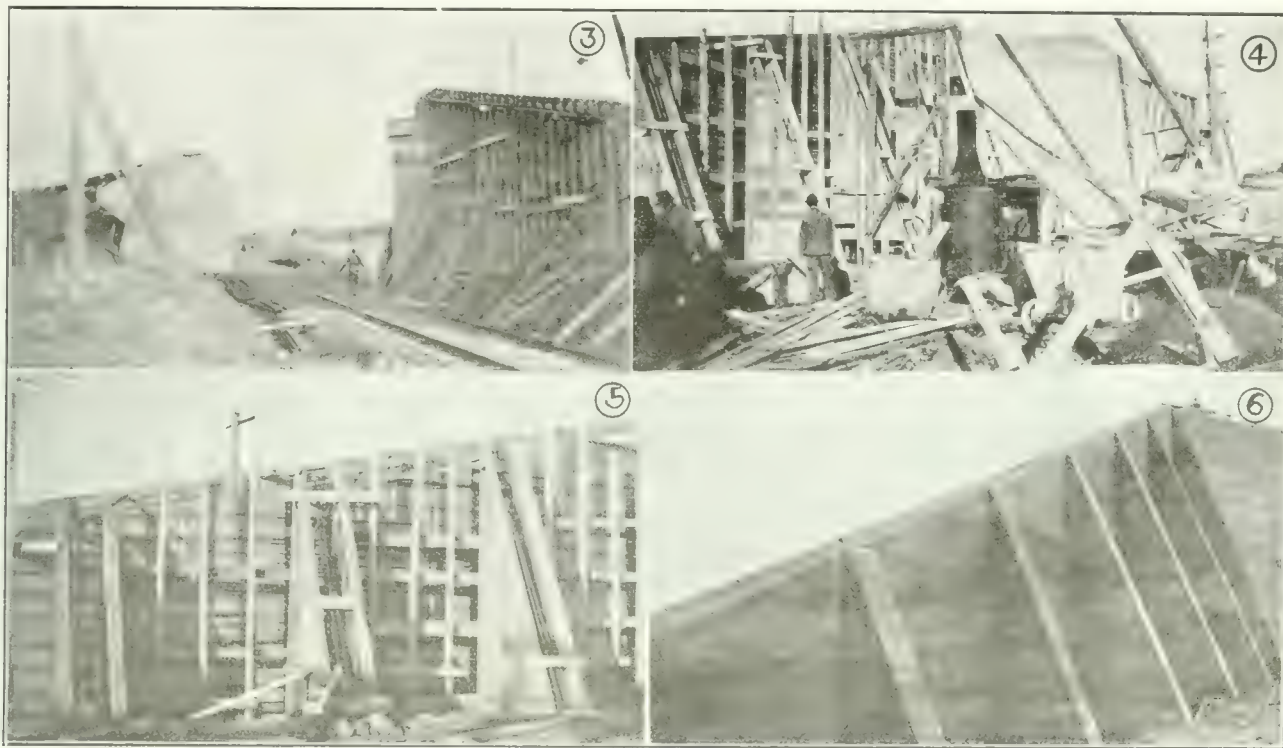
Abutments in place on either side of the C.P.R. line. Figs. 4 and 5.—Formwork and reinforcing of wall ready for concrete. Fig. 6.—Completed wall from counterfort side.
